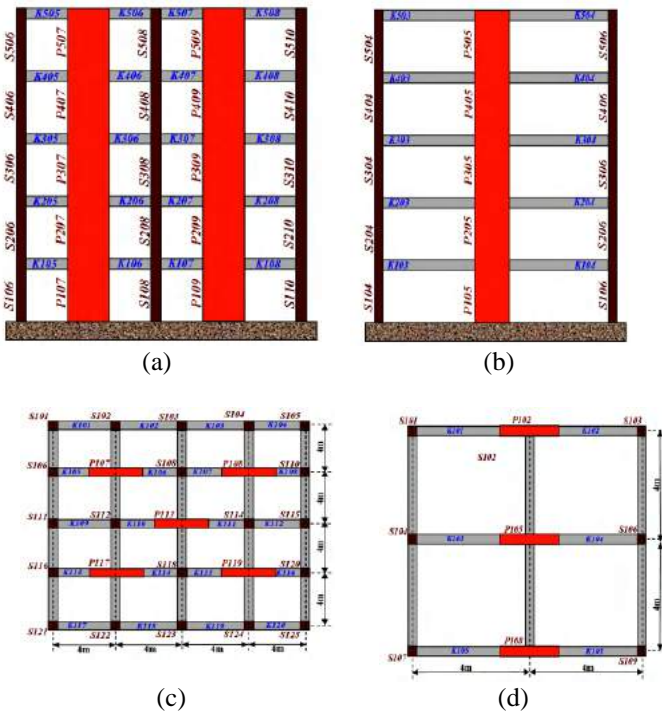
Storey -length sections (a,b) and plans (c,d) for S₁ (a) and S₂(b)
